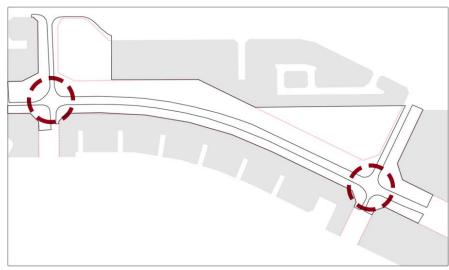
Feature elements are used to accentuate road intersections (Author 2014)
